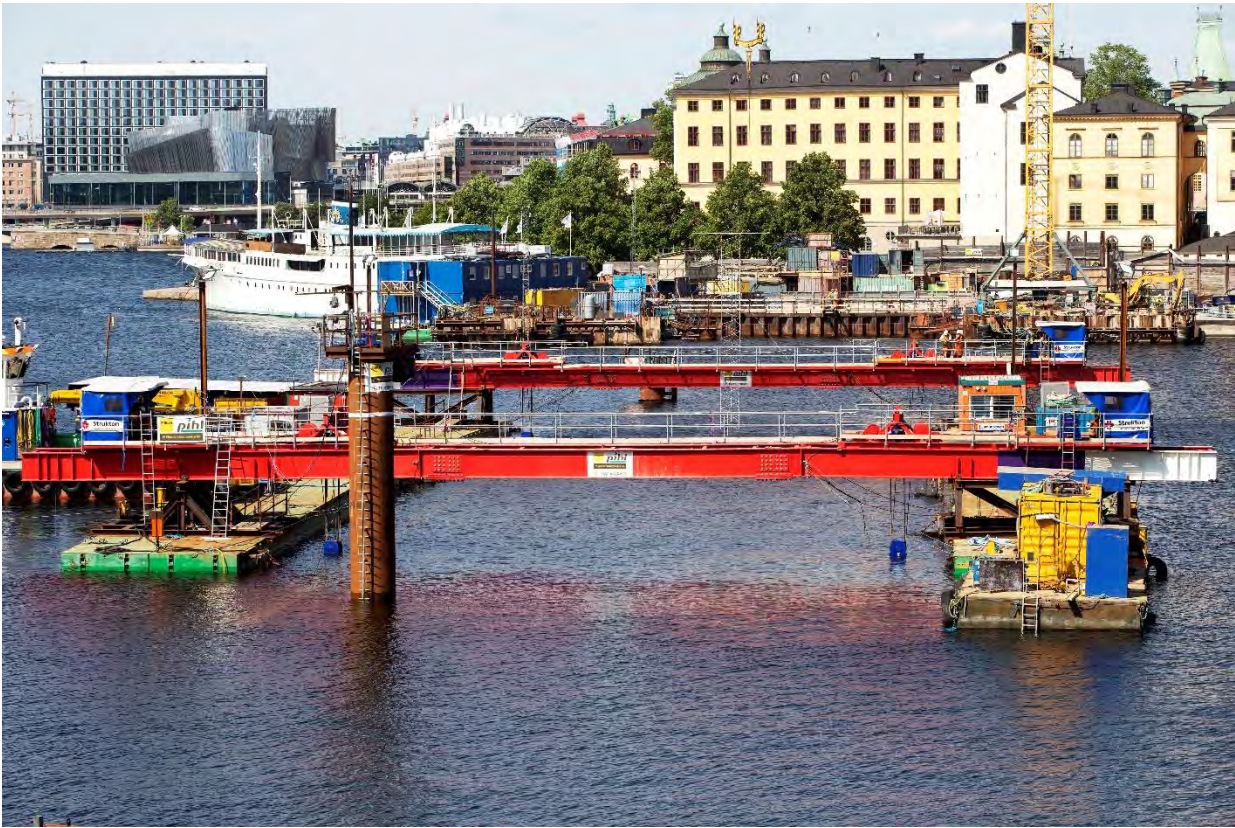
Example of immersed tube tunnel unit being immersed for the Soderstrom tunnel in Stockholm (Source: provided by Strukton)
